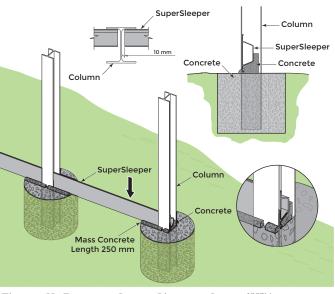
Bottom SuperSleeper Super<sup>100TM</sup> Installation on Concrete
